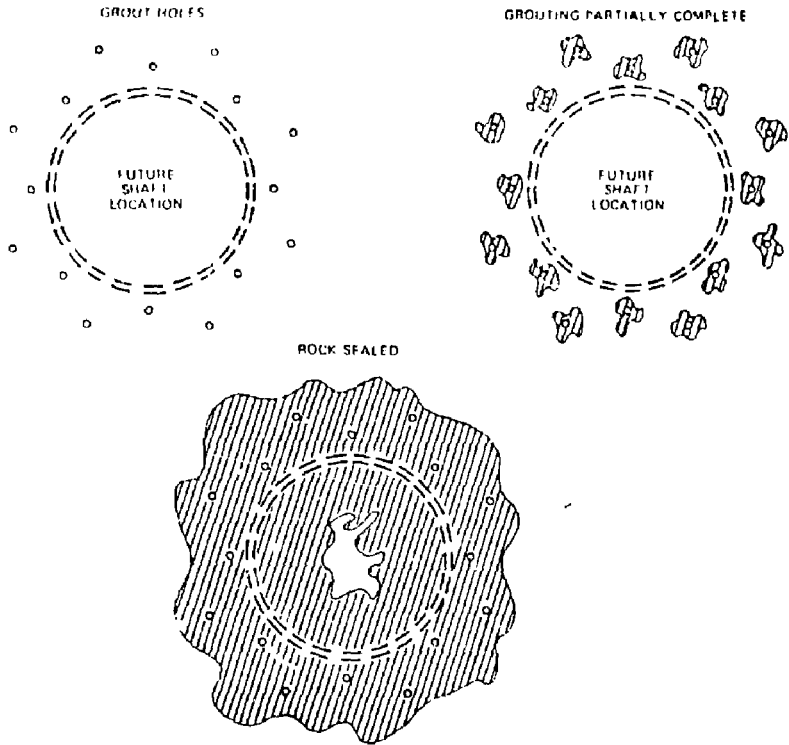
Illustration of pre-grouting prior to sinking shaft through water bearing zone
